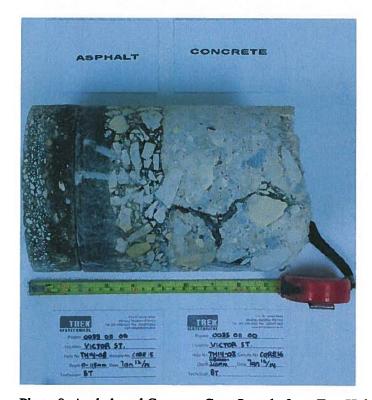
Asphalt and Concrete Core Sample from Test Hole TH14-08
